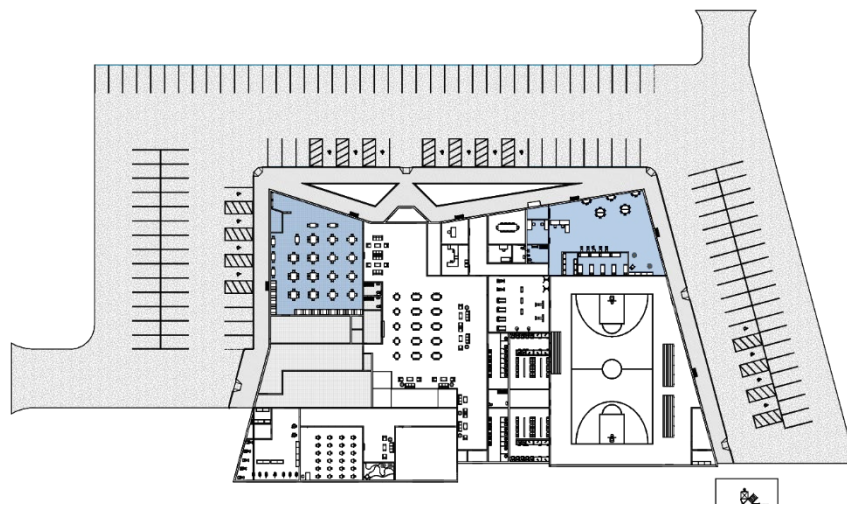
Floorplan with Restaurant and Childcare Highlighted
